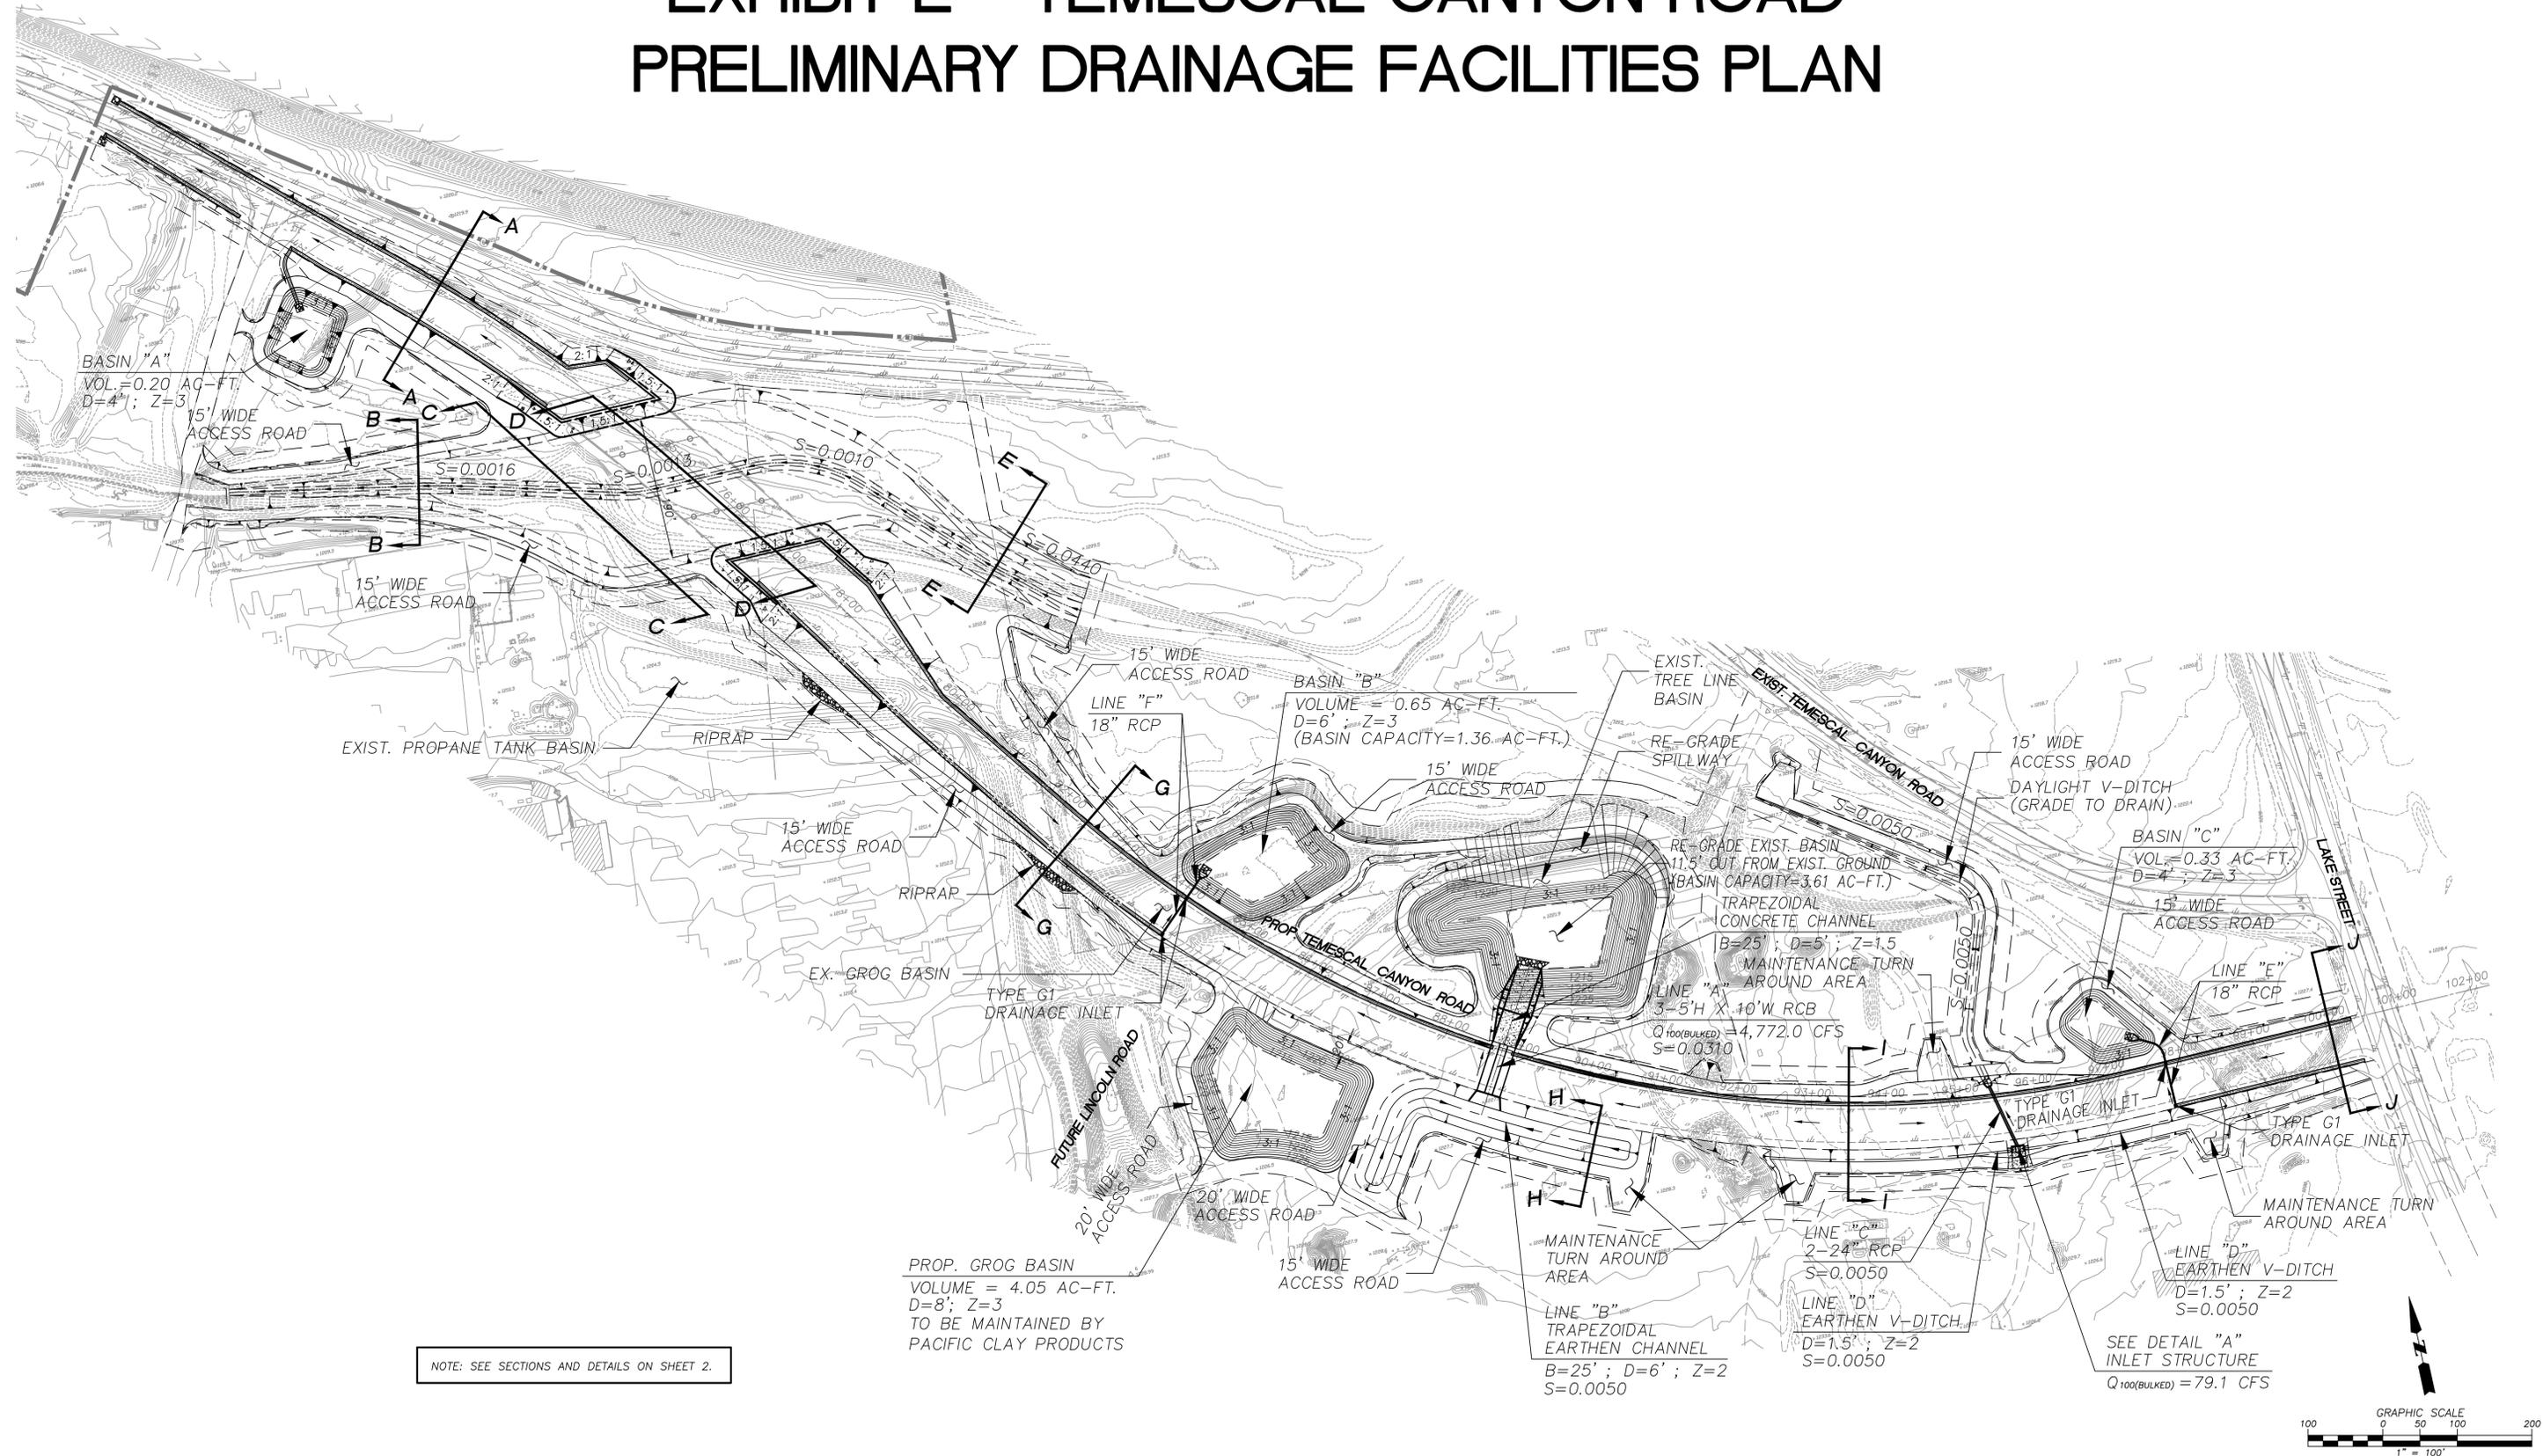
C - PRELIMINARY CHANNEL AND DRAINAGE PLAN
